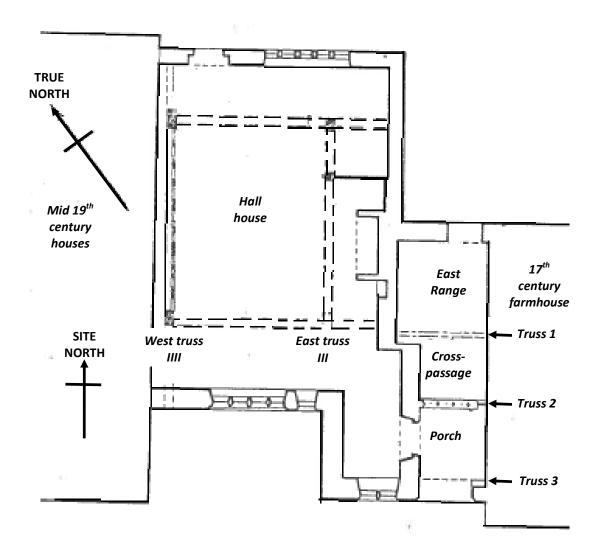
Plan of Broad Bottom Old Hall to show layout and arrangement of the trusses (after CF Stell 1965)
